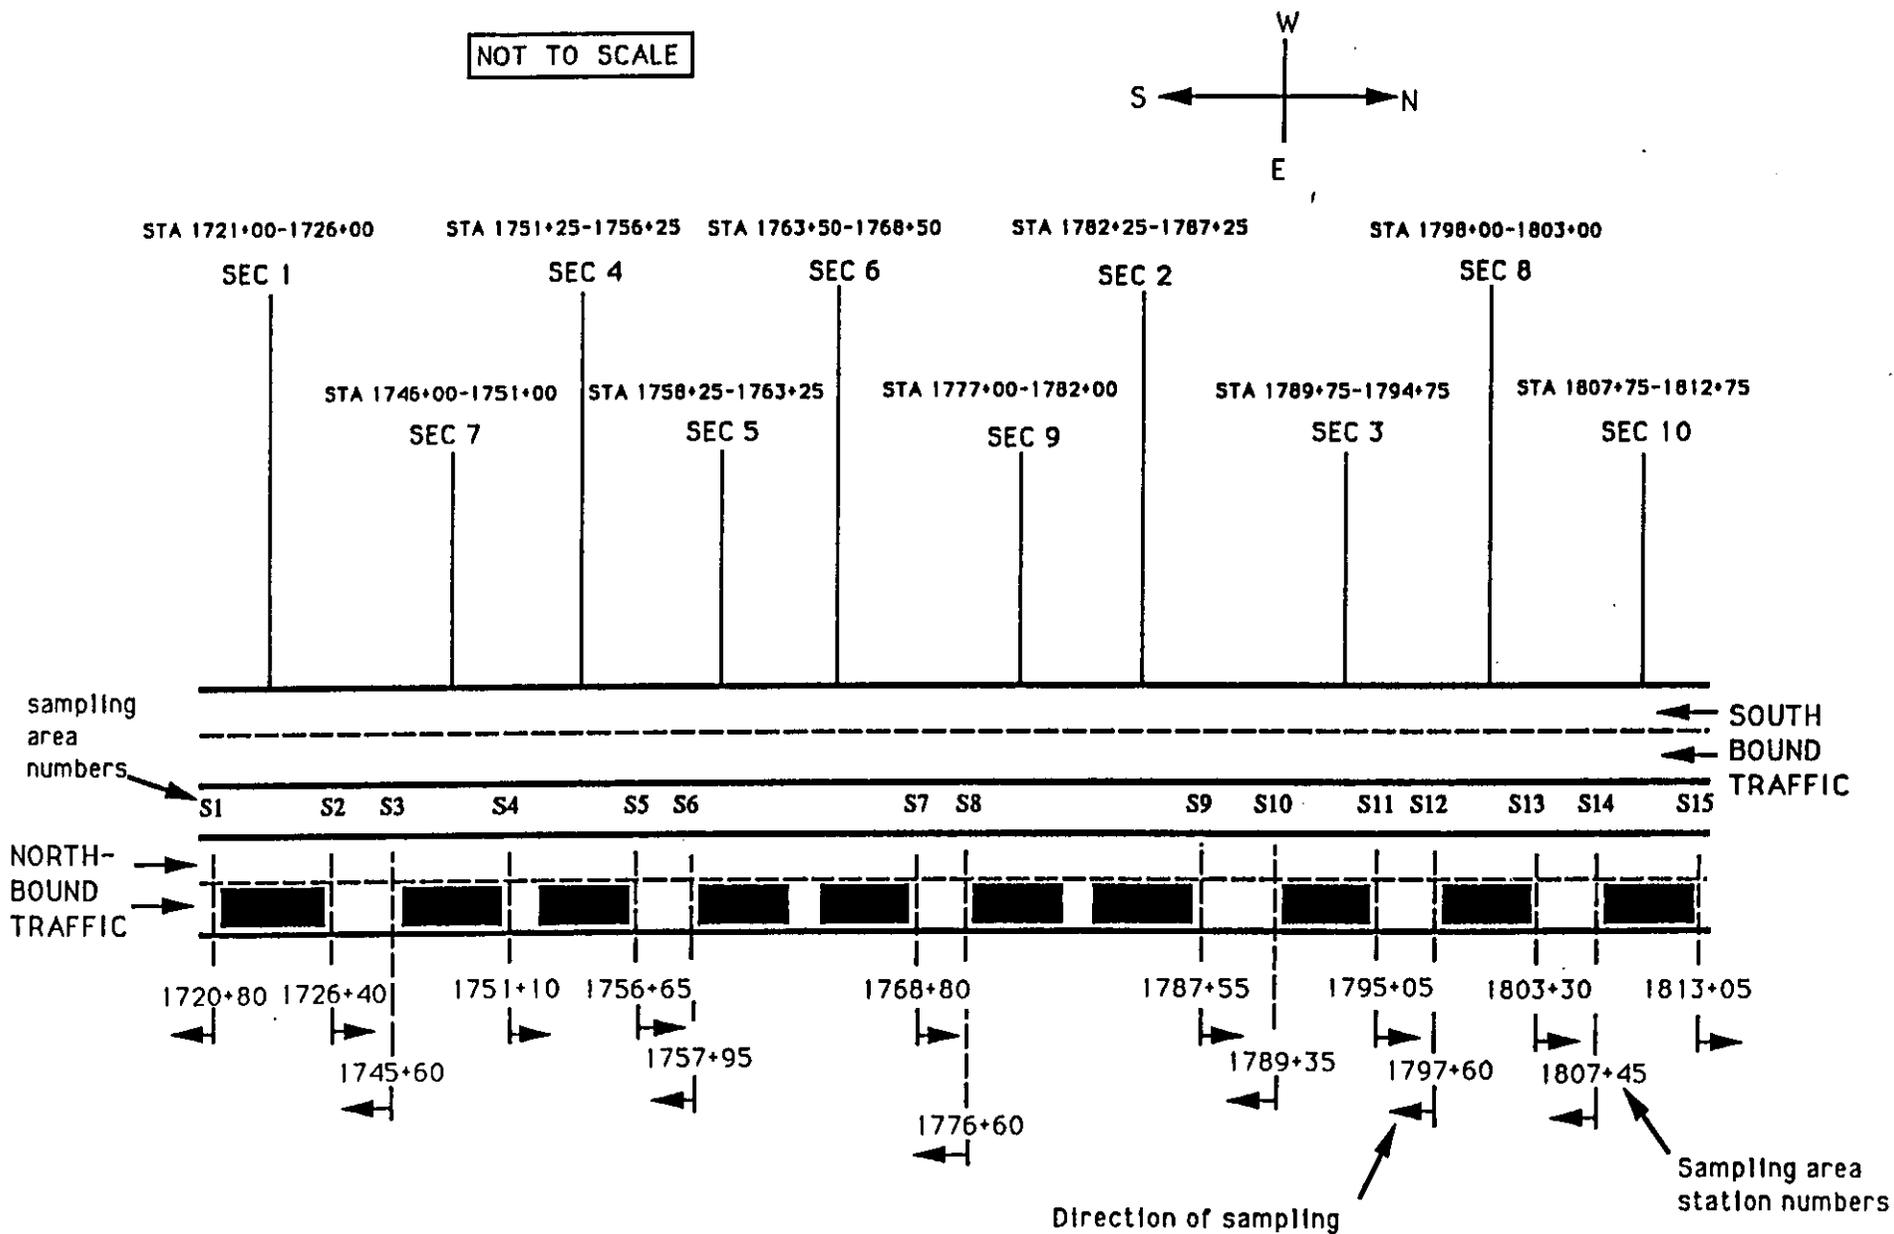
Schematic layout of test sections before overlay for SPS-5, Mississippi showing locations
